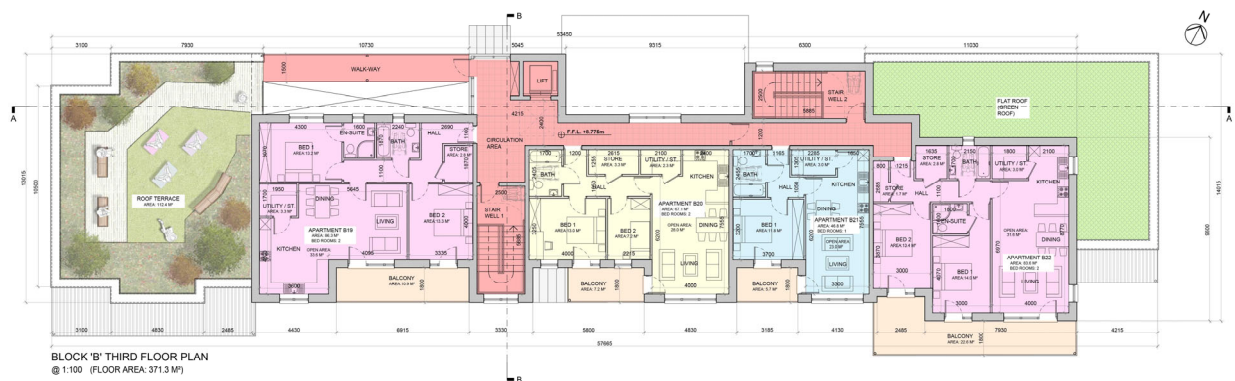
Third floor plan of apartment block 'B' showing the variety of apartment types and the communal roof garden for all apartment residents.
